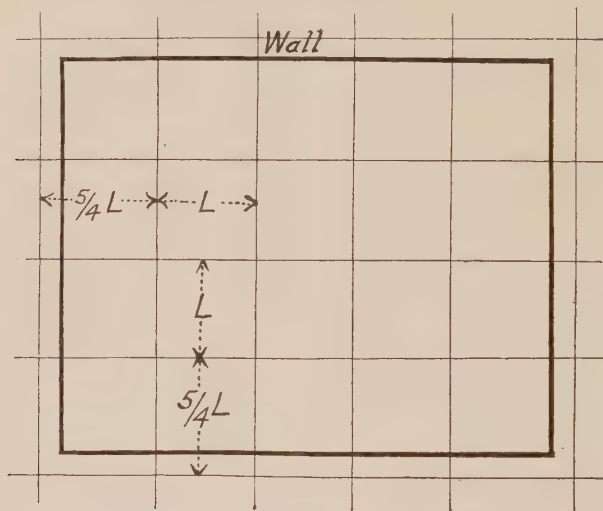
PLAN OF THE PANELS OF A FLOOR SLAB UNIFORMLY LOADED RESTING ON BEARING WALLS, AND OF THE PANELS OF AN INDEFINITE EXTENSION OF THE SAME WITHOUT WALLS AND UNIFORMLY LOADED, IN WHICH THE STRESSES IN THE EXTENDED WALL PANELS ARE PRACTICALLY THE SAME AS THOSE IN THE ORIGINAL WALL PANELS.
